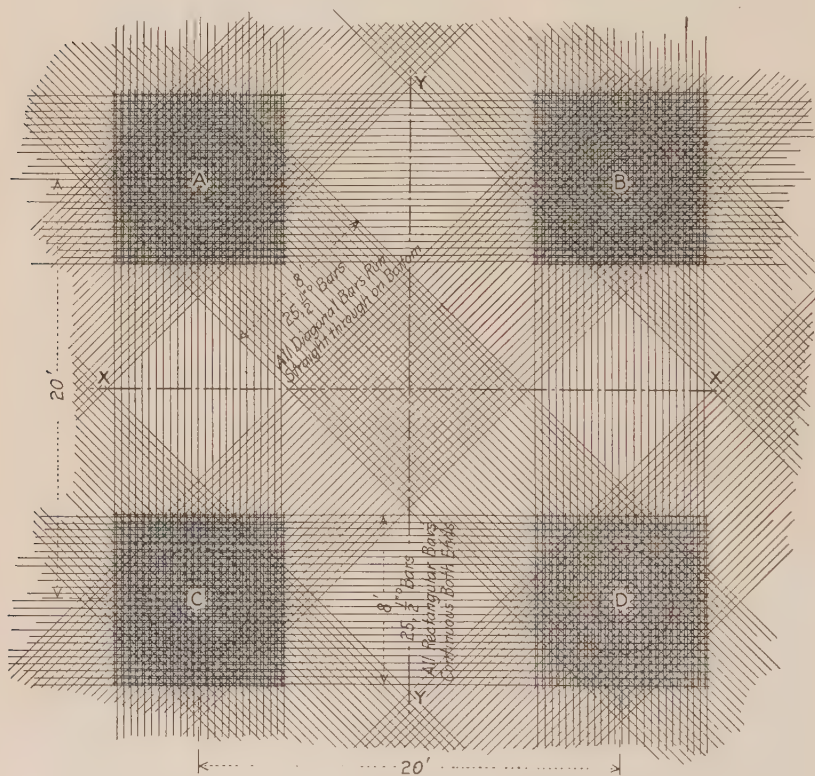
PLAN SHOWING ARRANGEMENT OF BARS.
